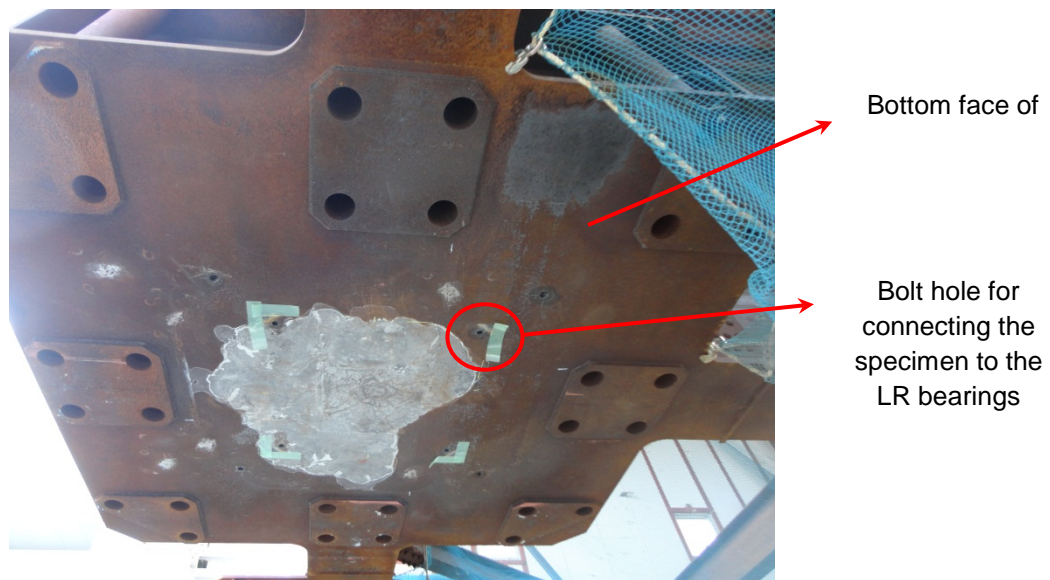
Installing the LR bearings to the connecting assemblies and the CL bearings to the simulator platform
